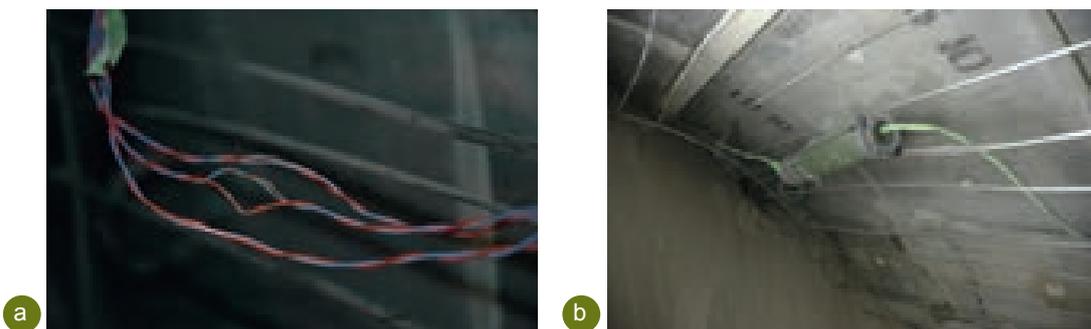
(a) Cable of thermocouple damaged by the sand backfilling; (b) damaged cable repaired by placing a tube over the damaged cable section.
